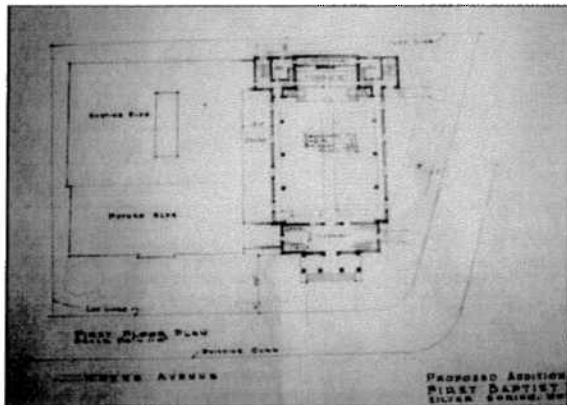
Proposed First Baptist Church of Silver Spring plan by Ronald Senseman.
